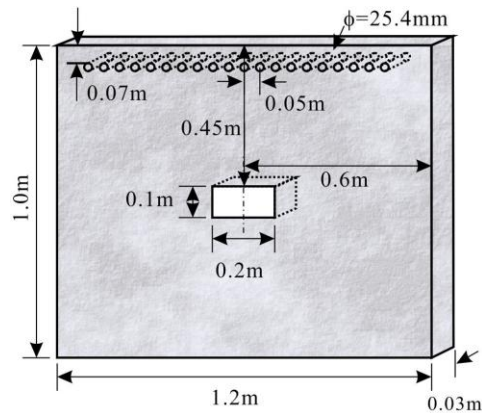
Dimensions of concrete specimen with single rectangular void and single layer rebar.
